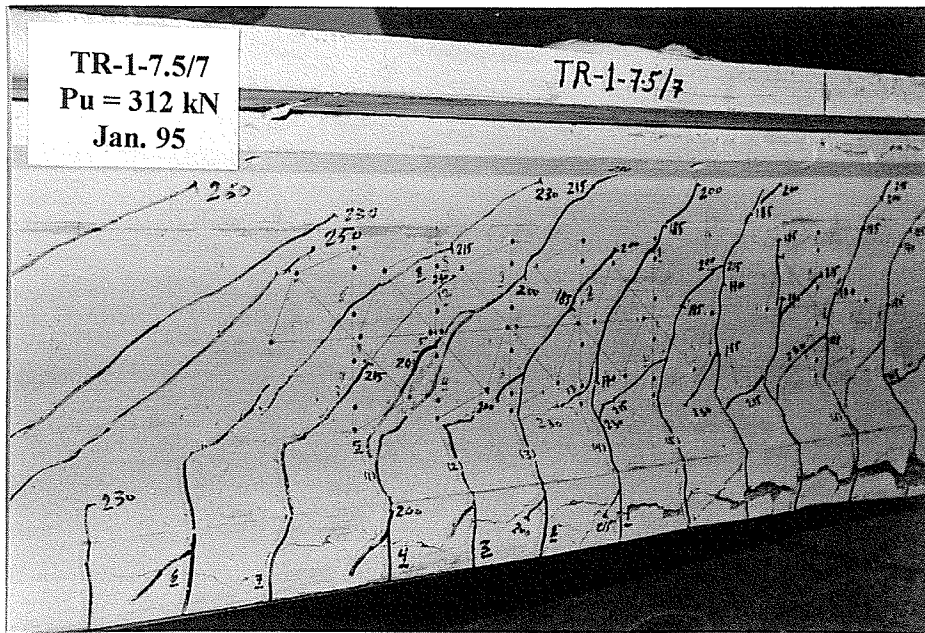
(a) Diagonal crack pattern of beam TR-1-7.5/7
